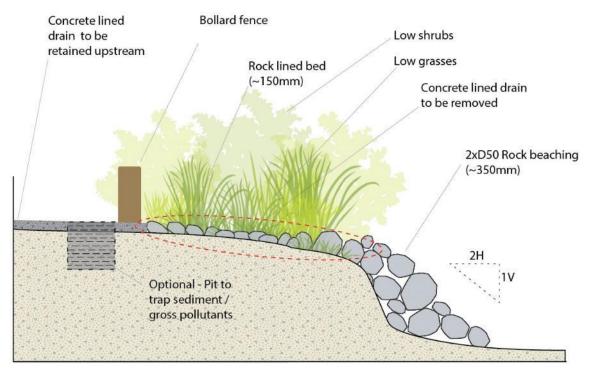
Typical design profile of a vegetated swale/ stormwater outlet for Lake Conjola
